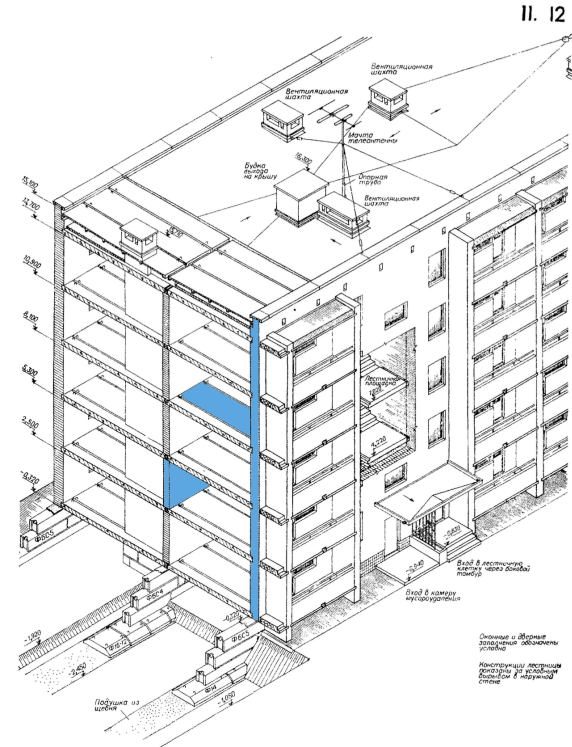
Axonometric Structural scheme. Masonry longitudinal and facade walls [31]
